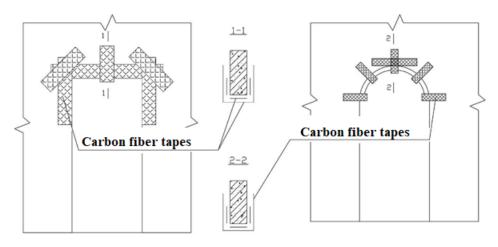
Reinforcement scheme: a) rectangular opening, b) arches
